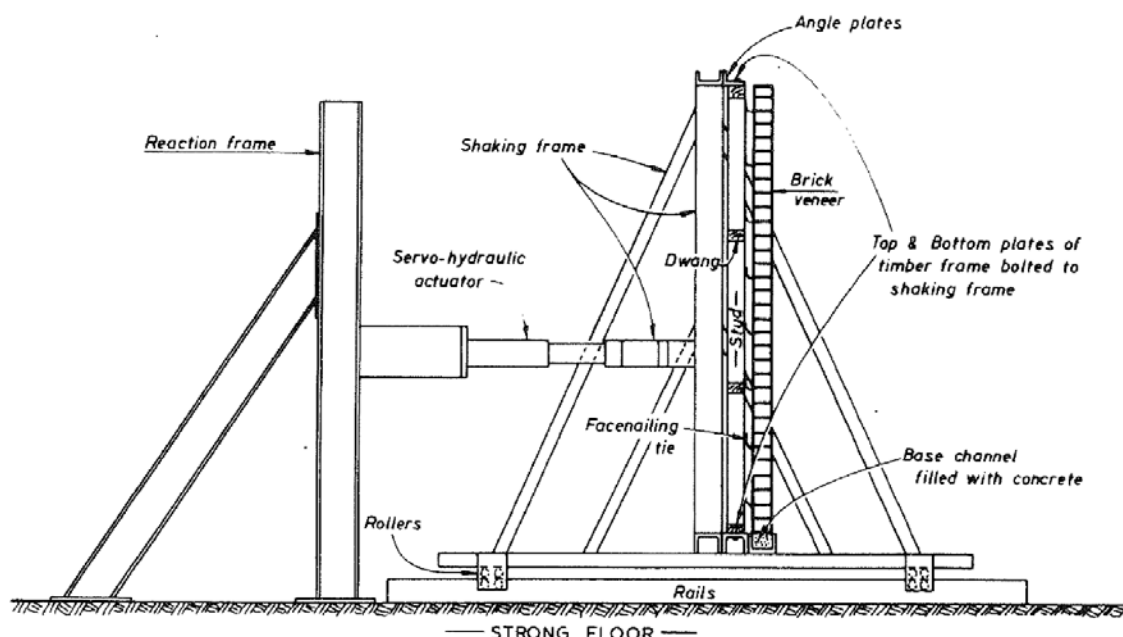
Test set-up for out-of-plane dynamic loading of clay brick masonry veneer walls (Priestley et al. 1979)
